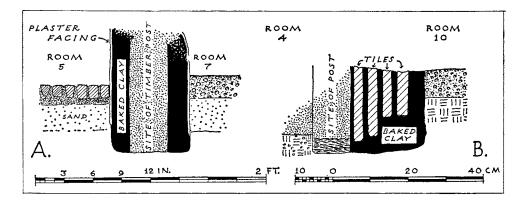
Insula XXVIII, timber-framed Building 3: Sections showing details of wall-construction preserved in the Antonine fire (A, Wall 5/7; B, Wall 4/10) (scale 1:10).
